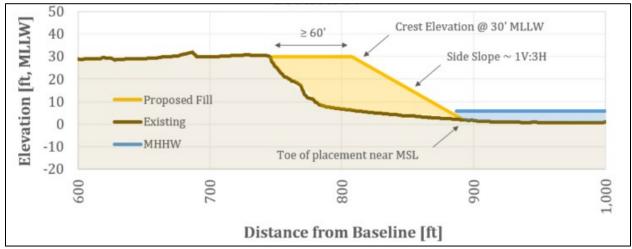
Example Cross-Section 57. (Plan View location shown in Figure 7)
